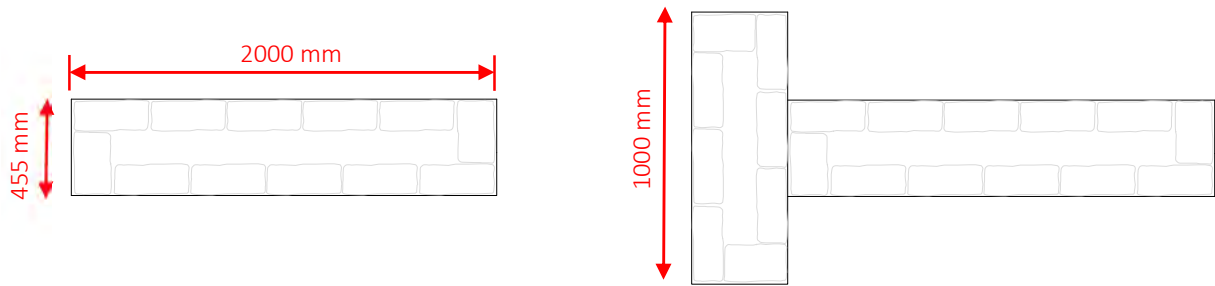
Plan view of the two wall-types: a) Rectangular; b) T-shape
